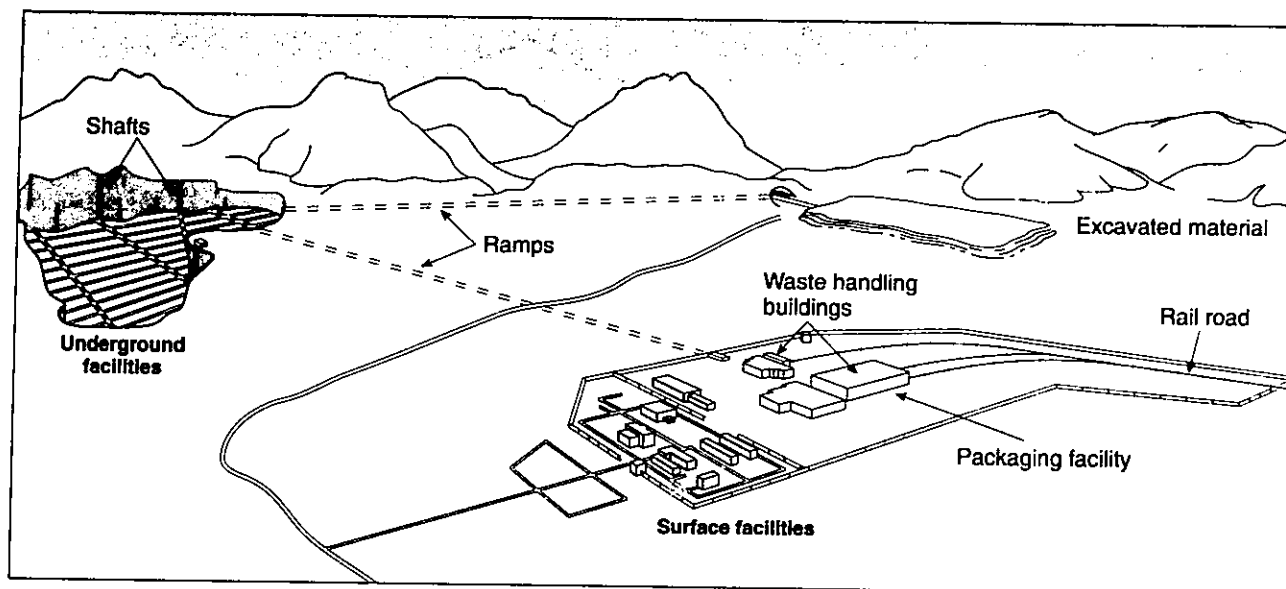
illustrates the planned layout of the repository. The surface facilities would be connected to the underground repository through two ramps and five shafts. The ramps would be mainly used to transport the waste disposal canisters and overpacks and excavated material. They would also serve as ventilation pathways. All five shafts would also be used as ventilation pathways. In addition, one shaft would be used for men and material transport. The repository would have two independent ventilation systems: one for the development of the repository and the other for waste emplacement operations.
